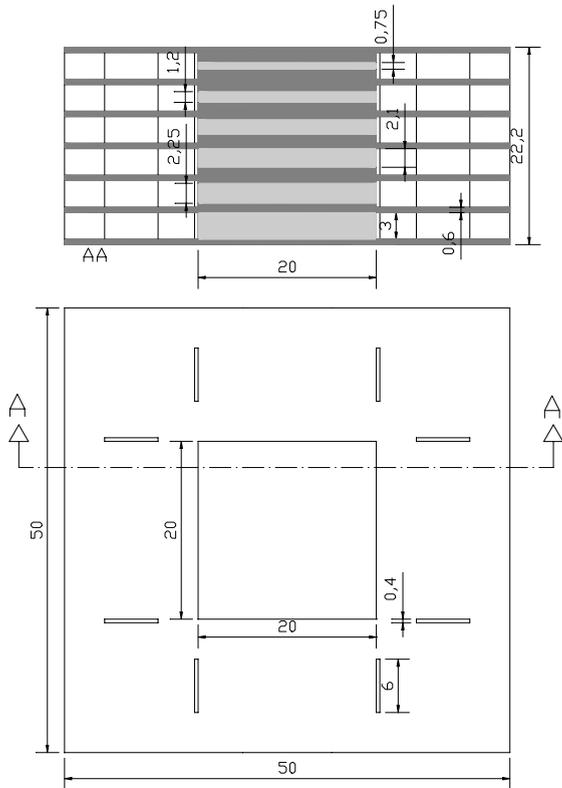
Plan and section of the atrium building-WI = 1.11.
